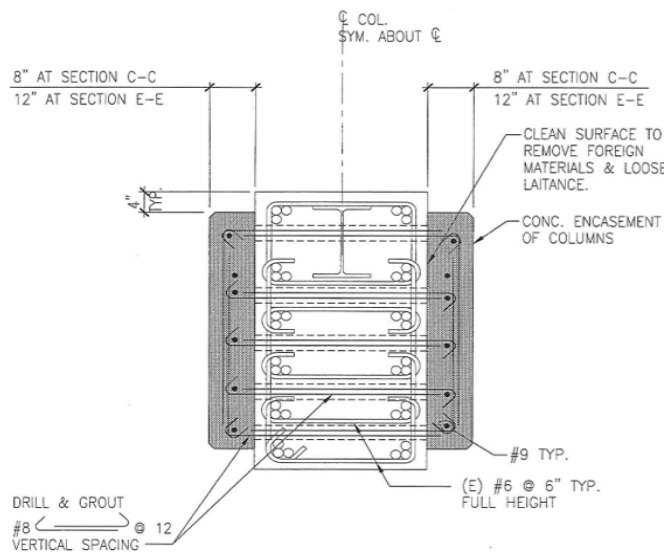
A typical Section of Column Enlargement by Reinforced Concrete Encasement
